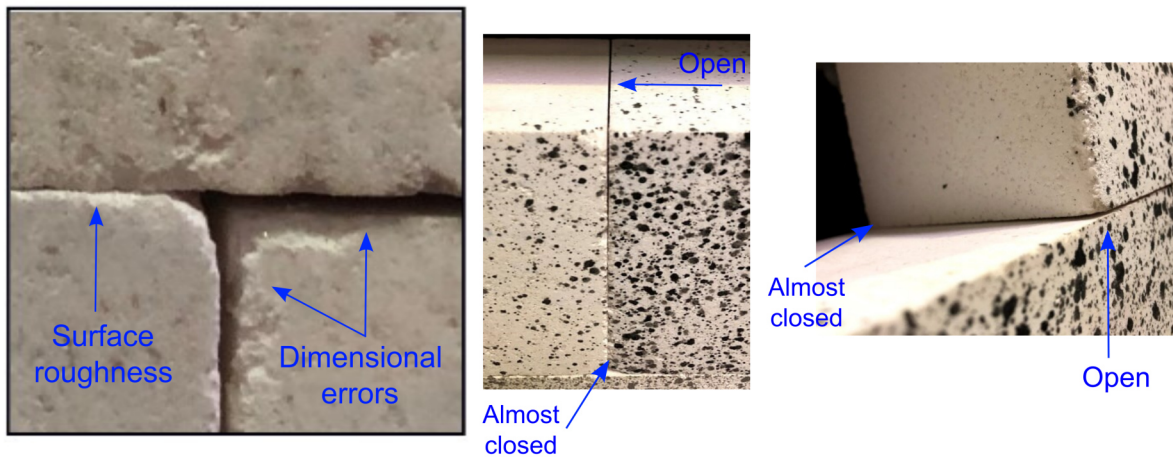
Nonuniform dry joints thickness and limited initial contact caused by the dimensional and shape tolerances of the bricks.
